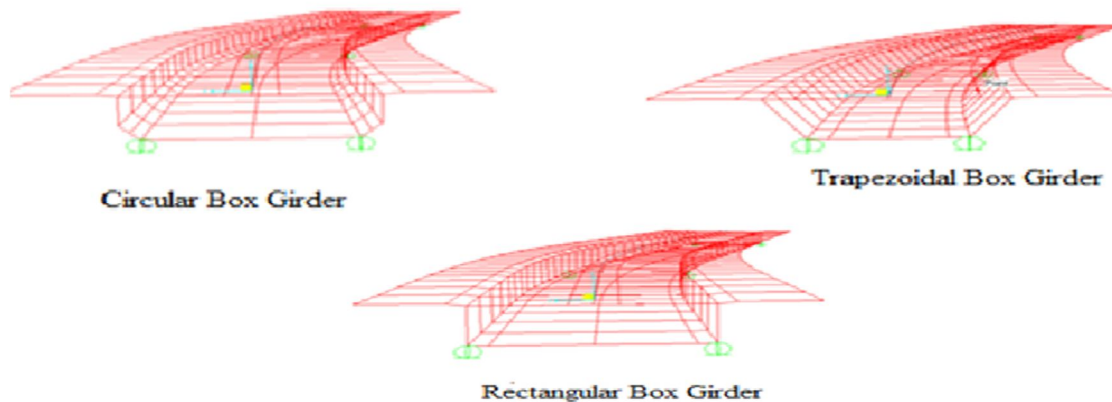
Curved Box Girders Modelled in SAP Bridge
